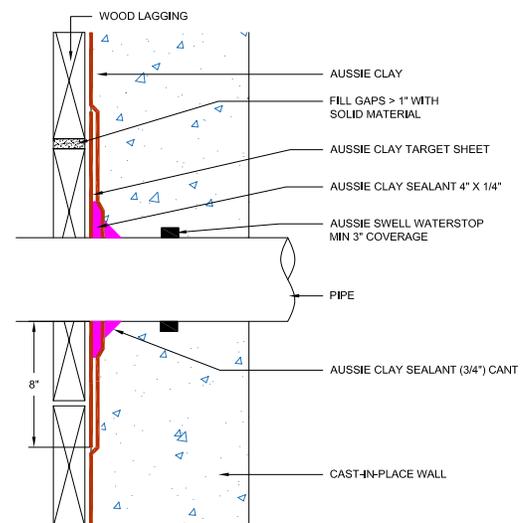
TYPICAL PIPE PENETRATION THROUGH LAGGING
